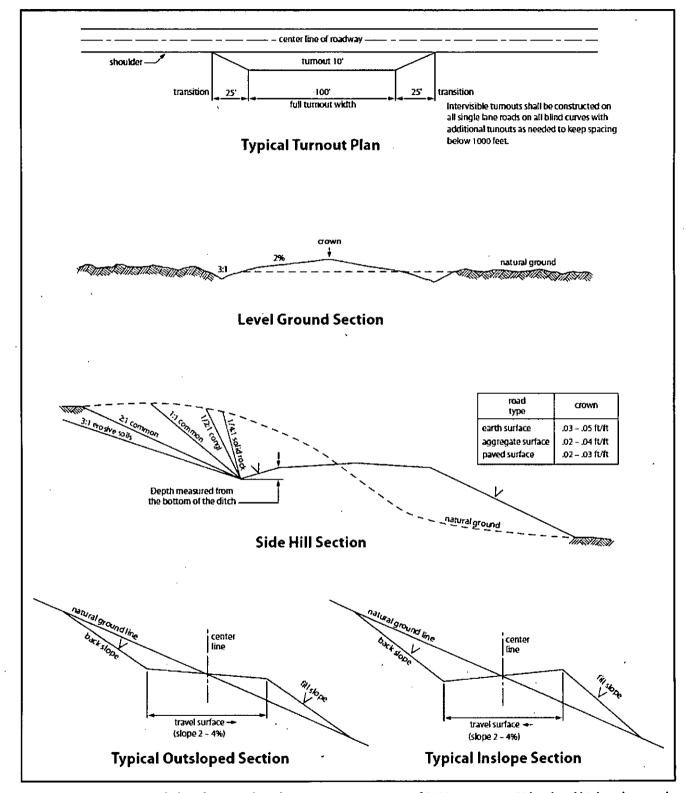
Cross-sections and plans for typical road sections representative of BLM resource or F5 local and higher-class roads.
